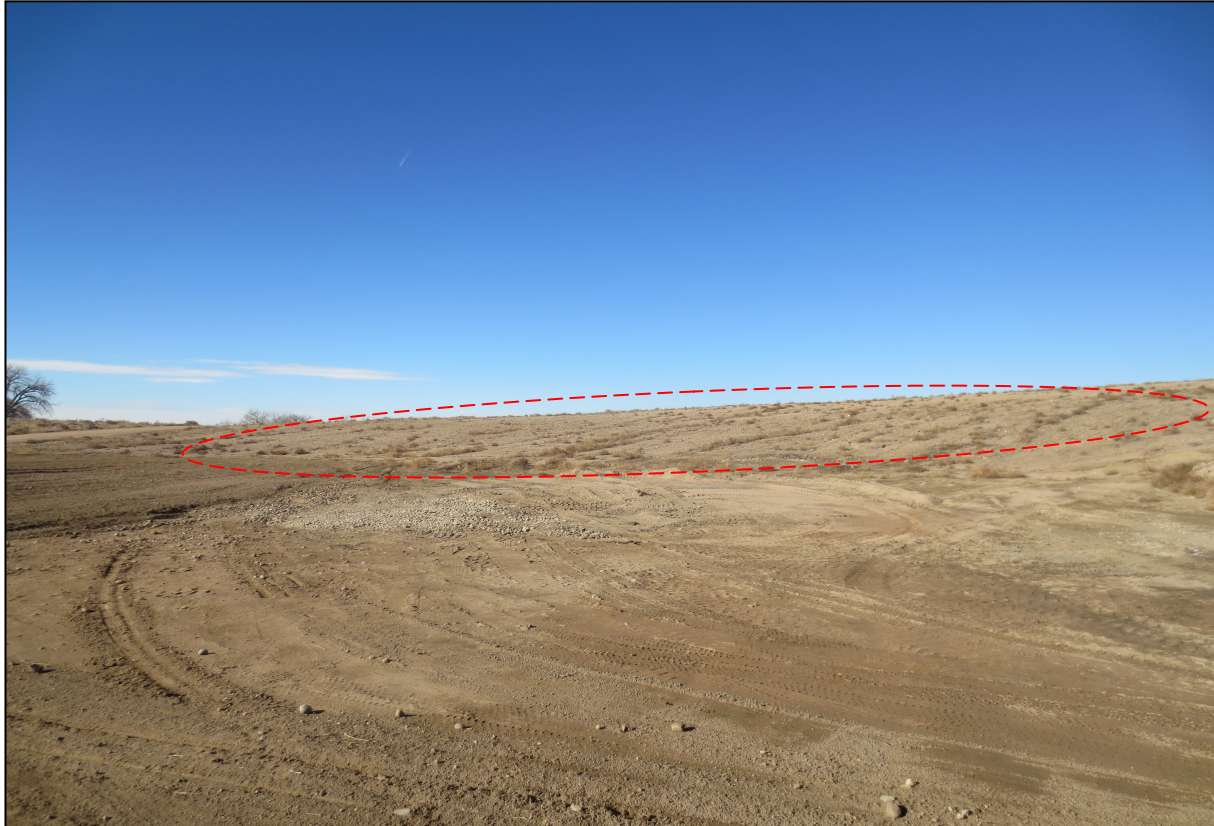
Southwest pit wall circled in red, reclamation ongoing progress.
